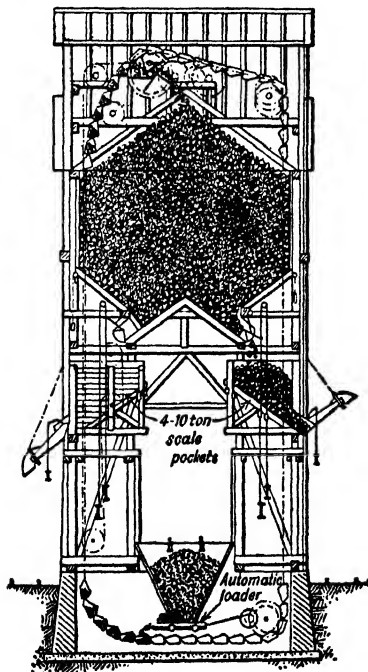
Hopper-bottom coal-storage pocket, with bucket carrier, for car or truck loading.
